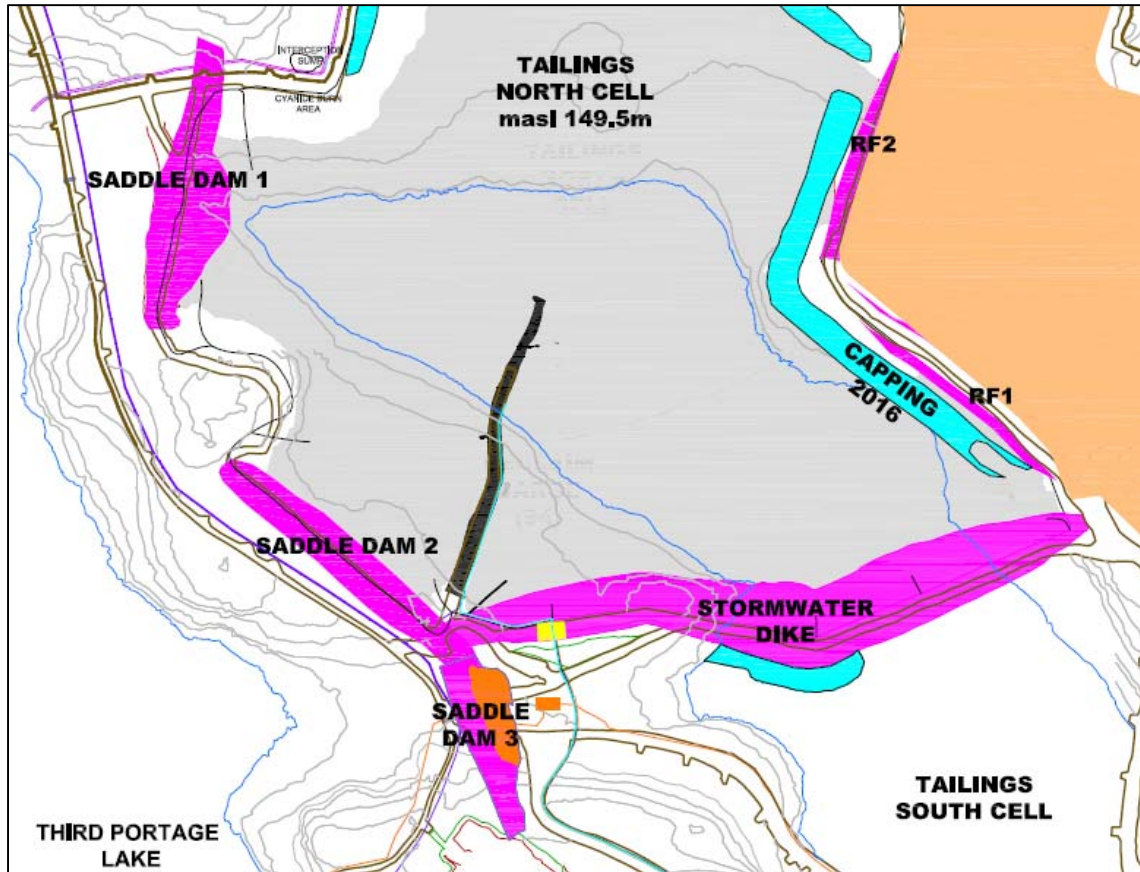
General arrangement of the TSF and the location of Stormwater Dike.
